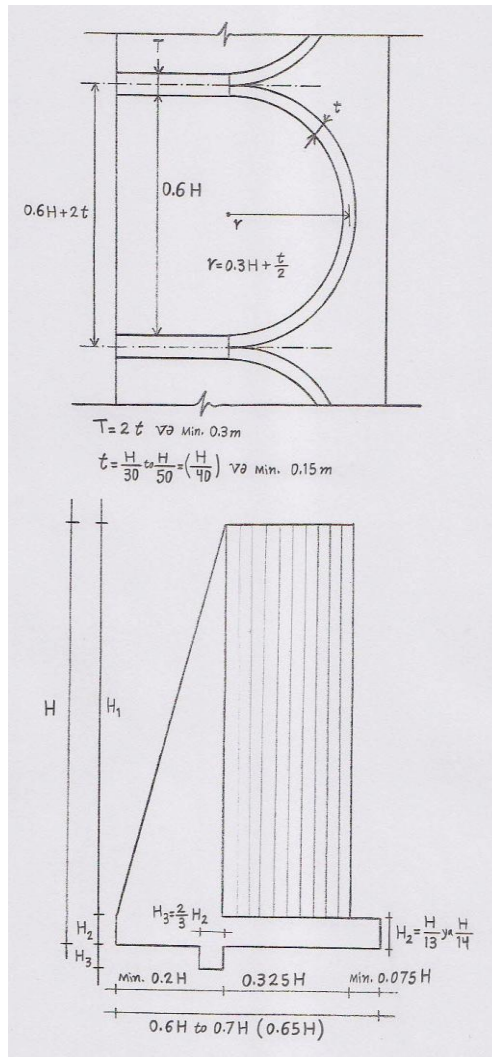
Tentative design dimensions for a multi cylindrical shell retaining wall.
